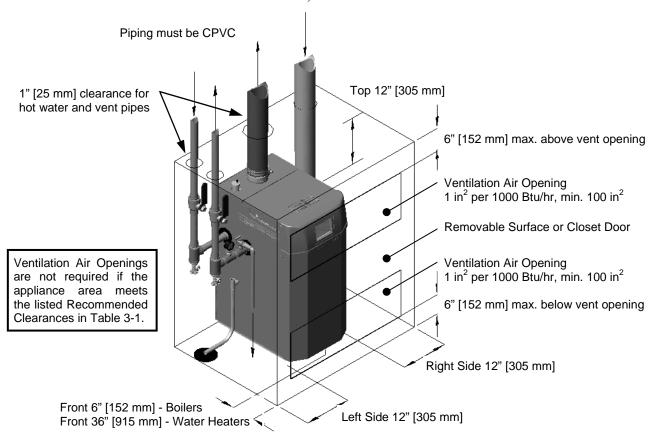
(a) Lx150-200 Models Wall Mounting Installations
